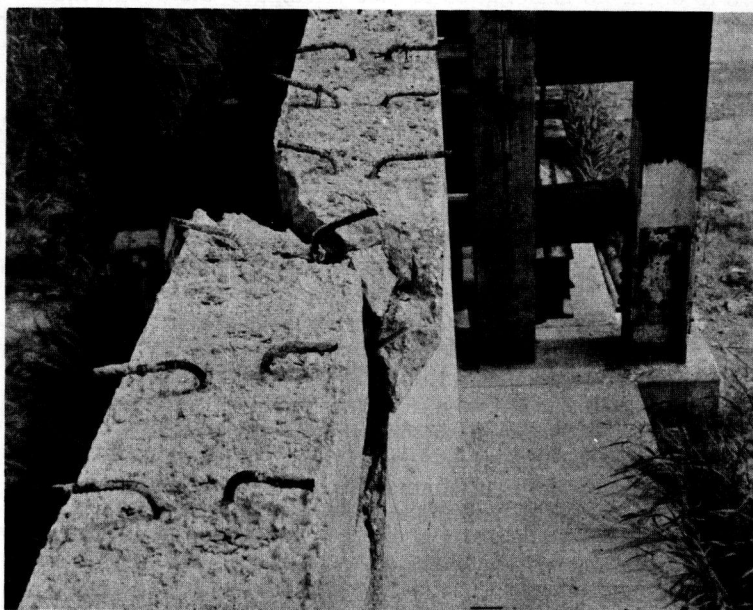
Beam failure, torsion test, pretensioned beam.
